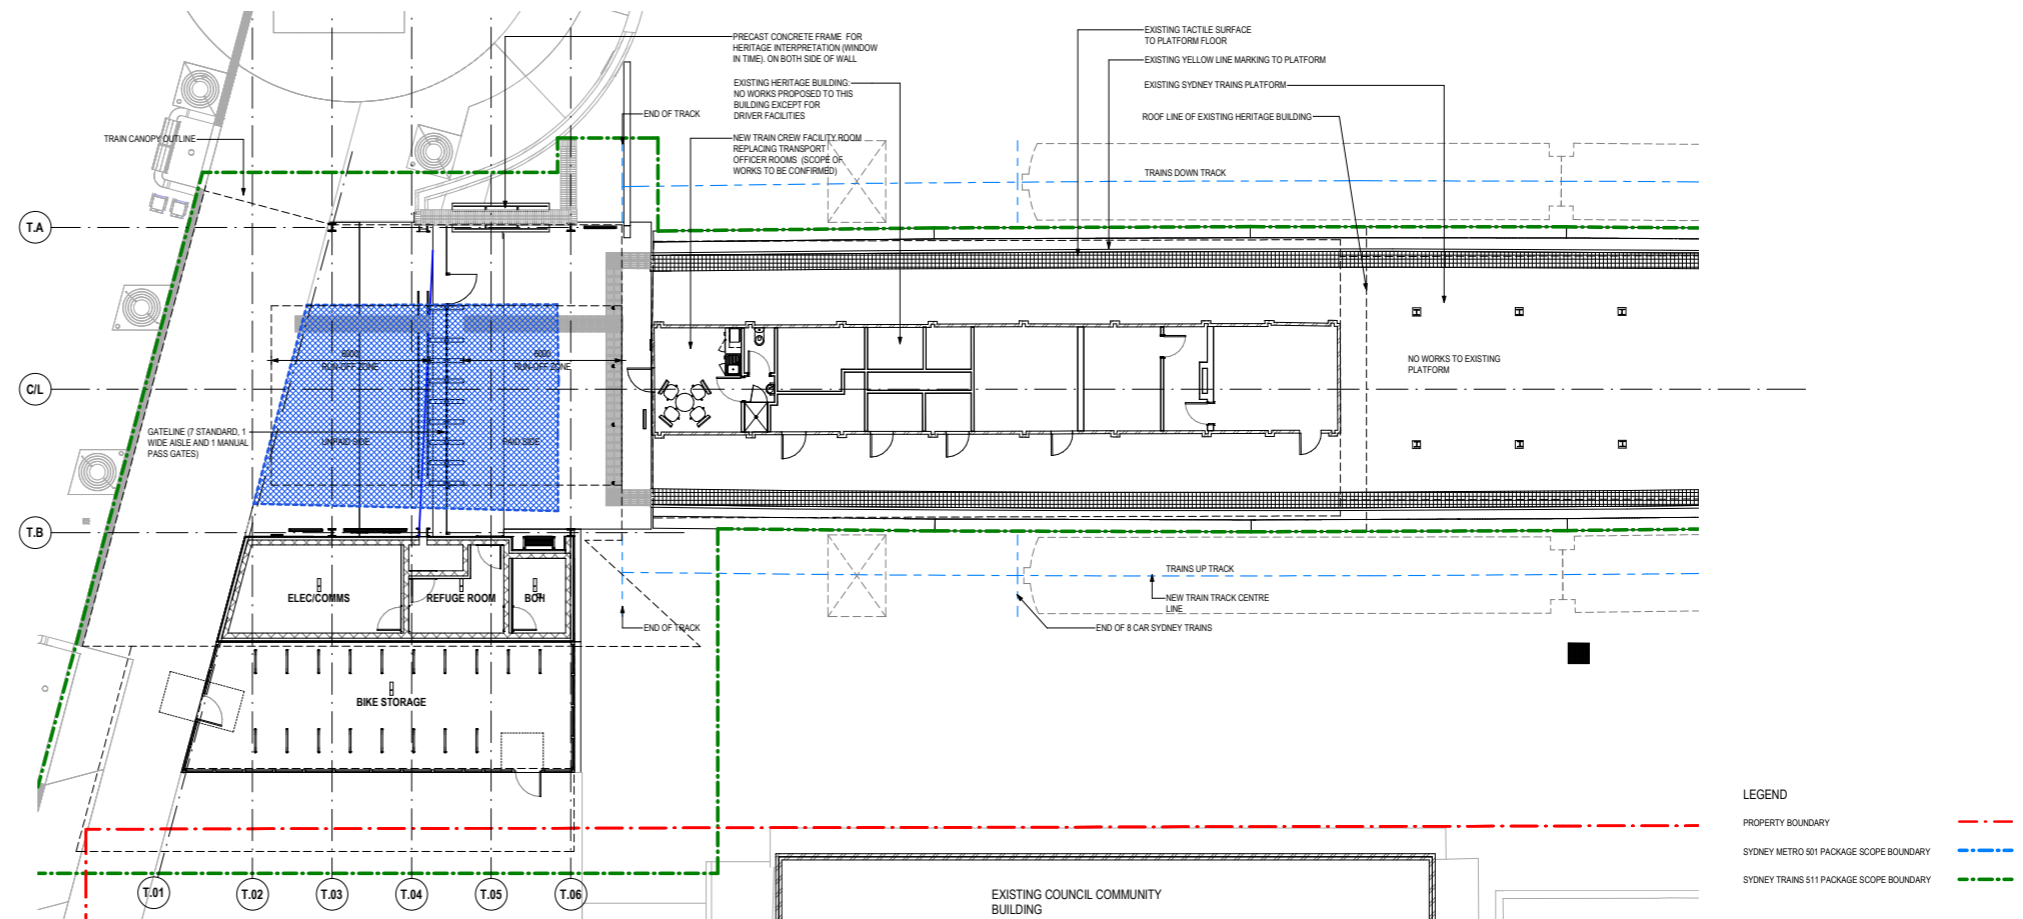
Sydney Trains new station entry and existing heritage platform building
